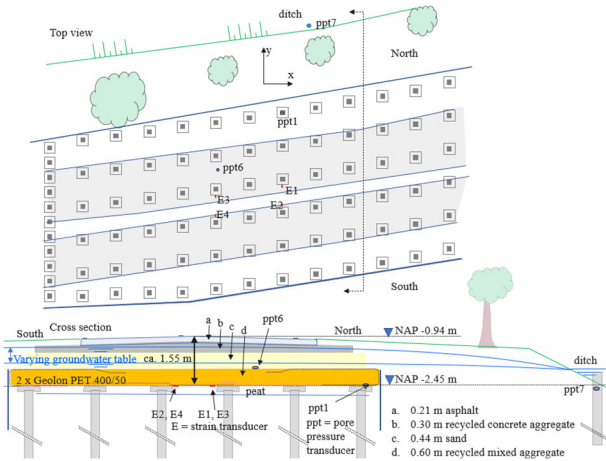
Lay-out of the geotextile-reinforced piled embankment and monitoring equipment. Modified after van Eekelen et al., 2023.
